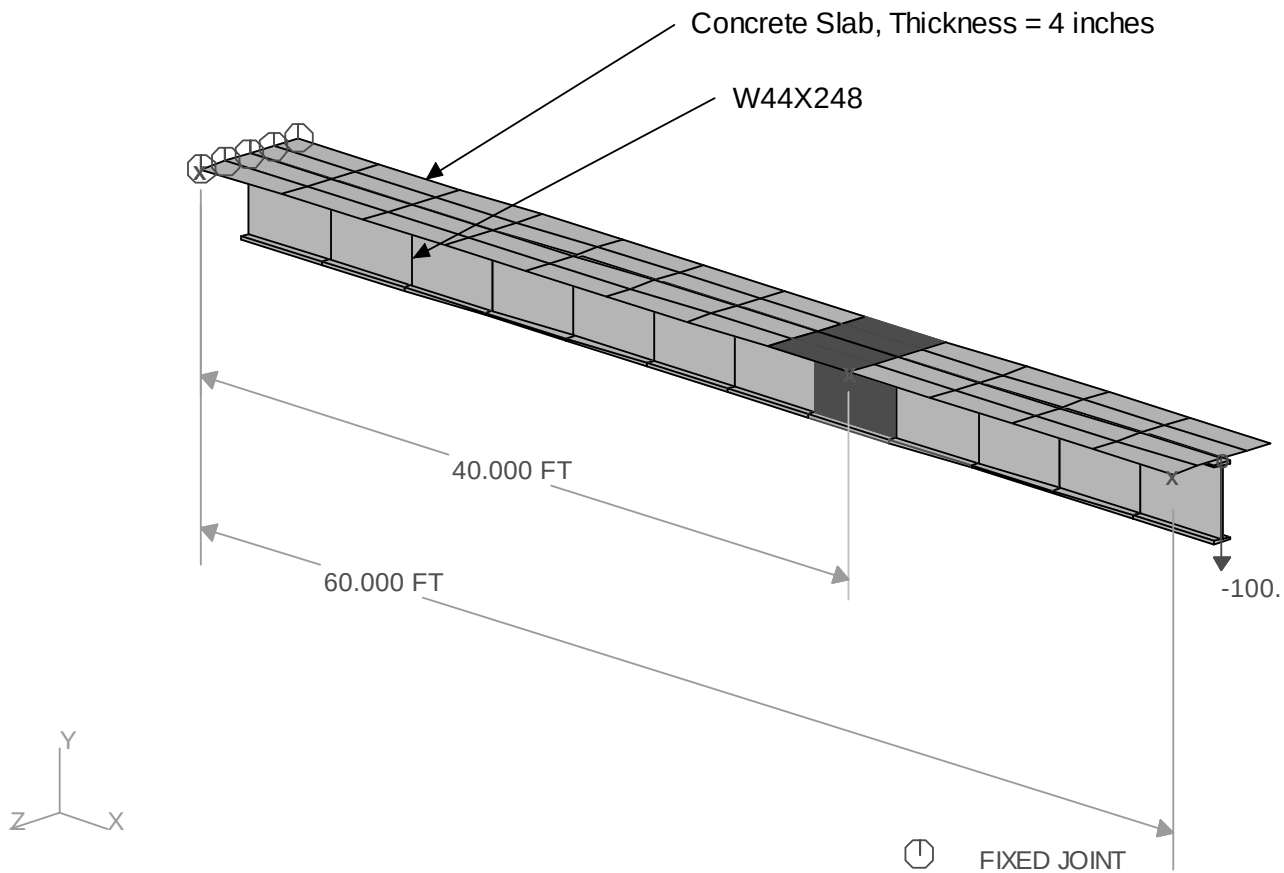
Example LFS01, Concrete-Steel Composite Cantilever Beam
